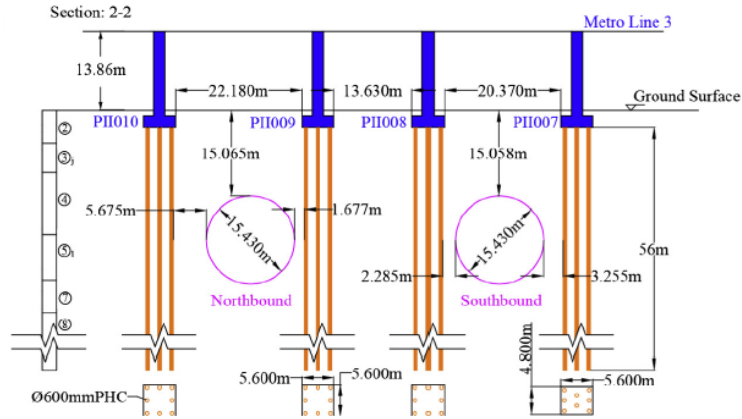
Sectional view of tunnel crossing bridge foundation (Liu et al., 2014)
